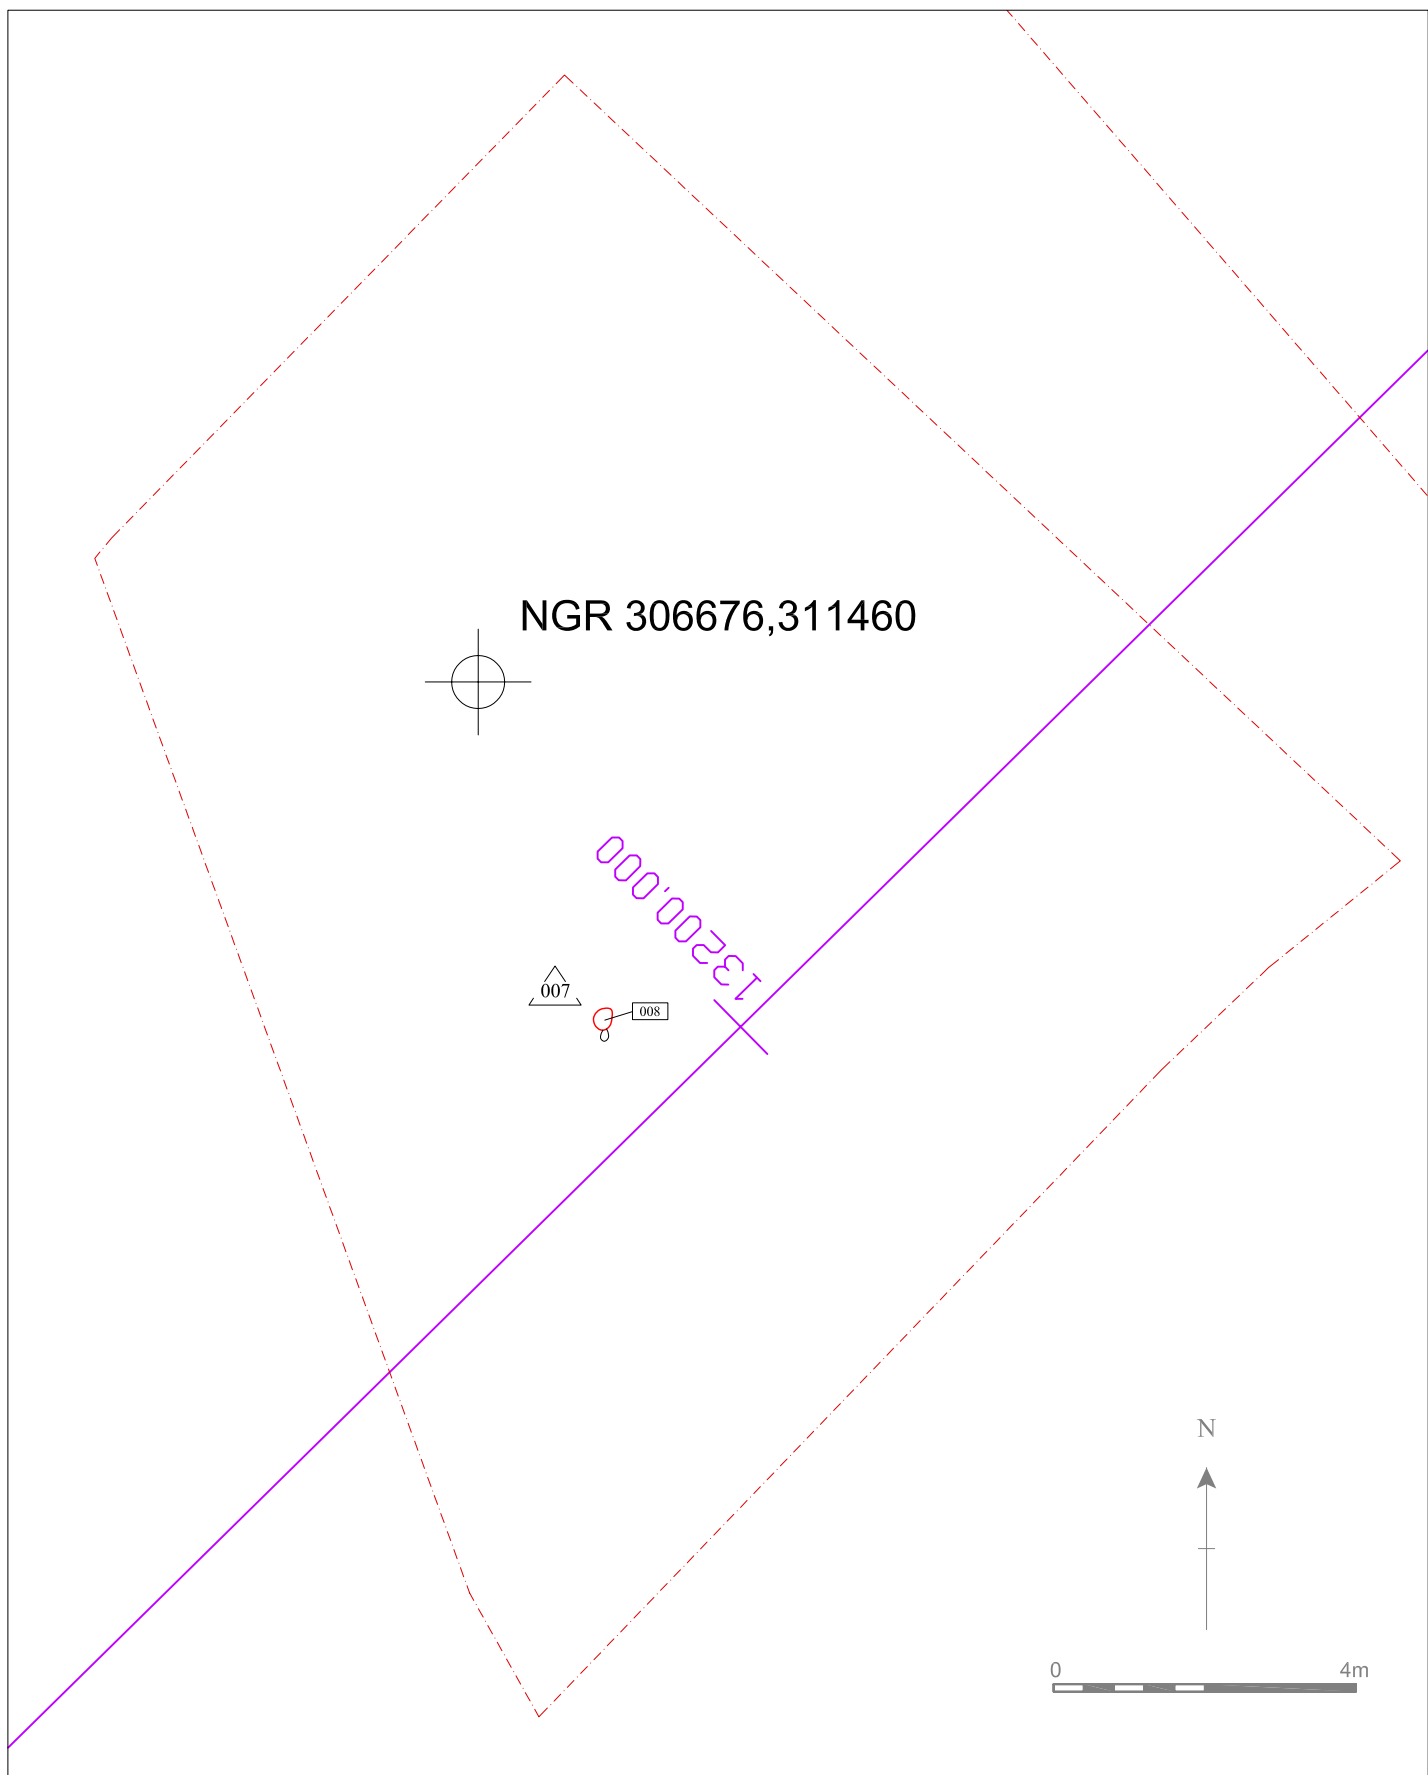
Plan showing location of cutting 115a. Scale 1:100.
